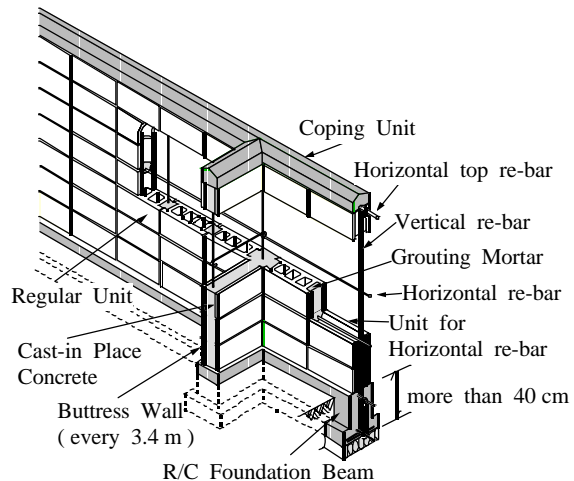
A reinforced concrete masonry garden wall designed by current AIJ standard
